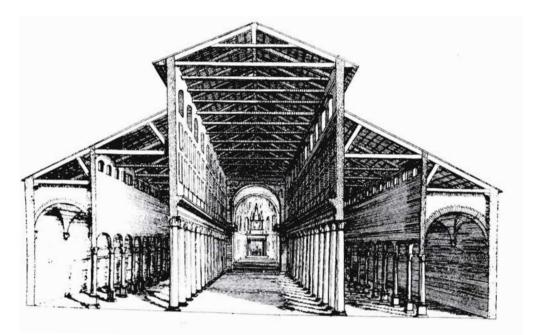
Cross-section through basilica with double aisles Earlier building on site of St Peters, Rome (I), 4th century AD
